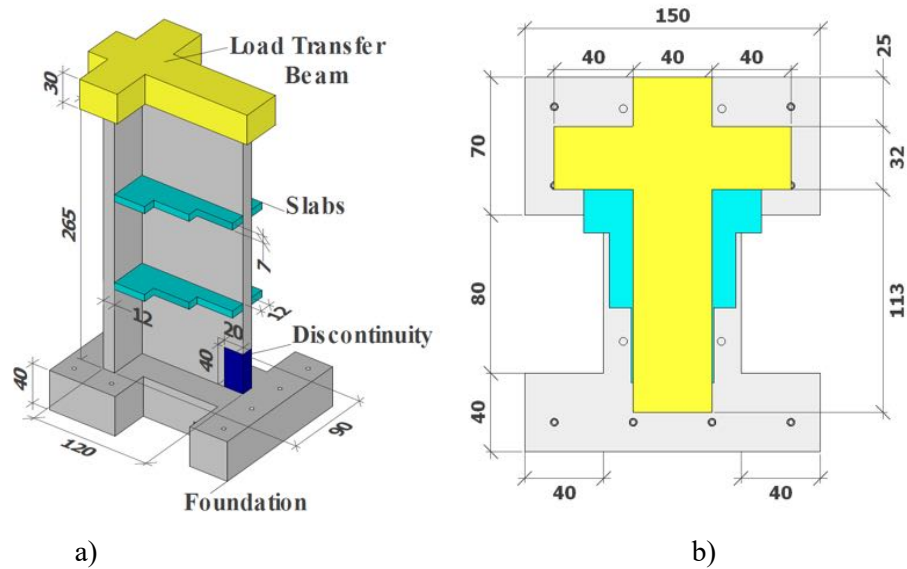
Wall dimensions; a) 3D view; b) Plan View. (Unit: centimeters)
